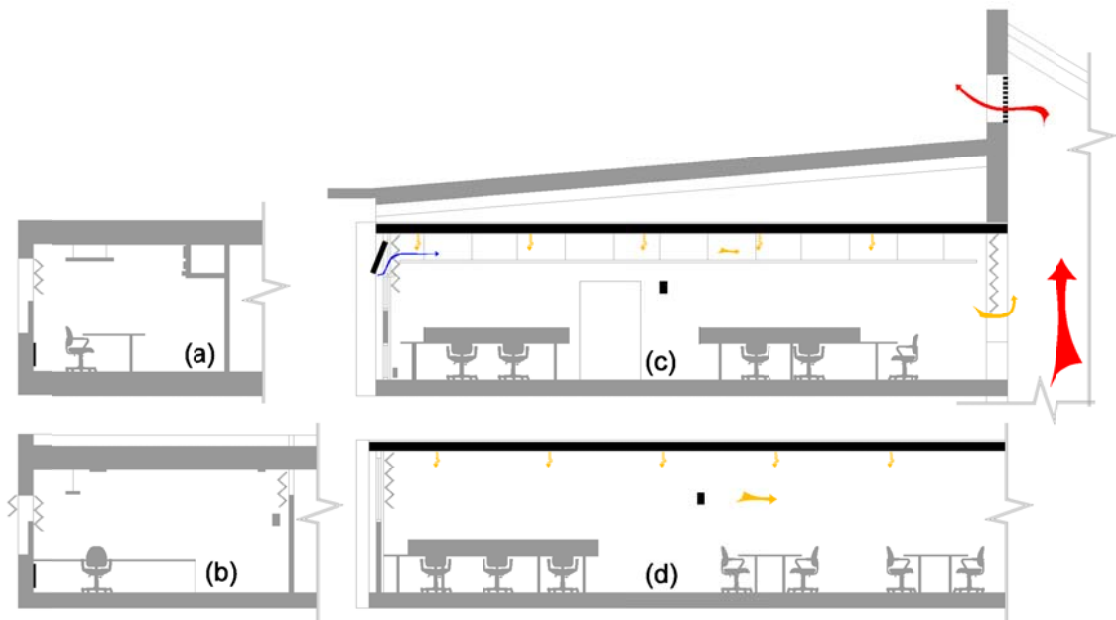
Winter night ventilation sections (a) Building A, (b) Building B, (c) Building C, and (d) Building D
